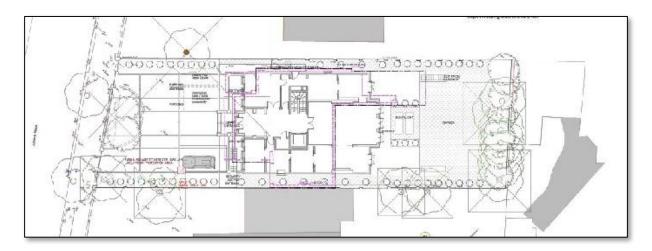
Extract of Plan 4, Proposed Site Plan.
